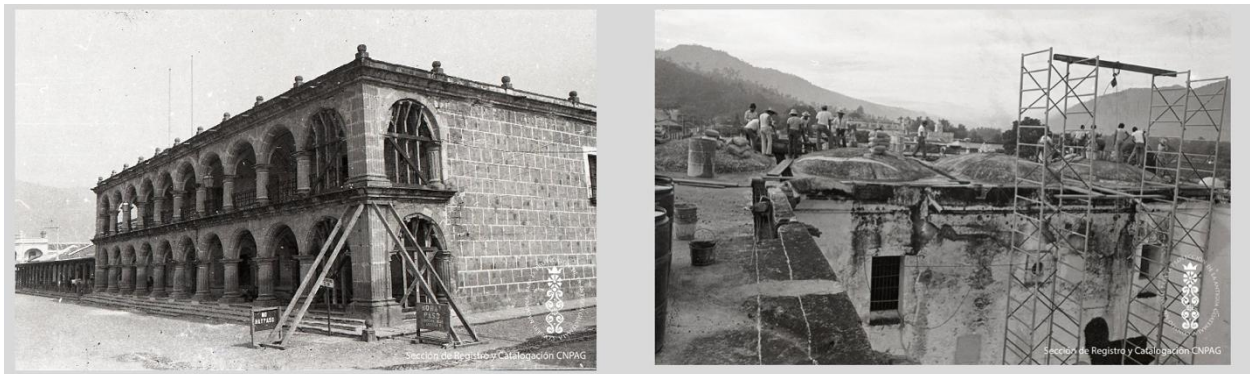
Stone columns and arches of City Hall showing damage to the southeast archway and roof domes from the 1976 earthquake (Photos courtesy of CNPAG Sección de Registro y Catalogación).
